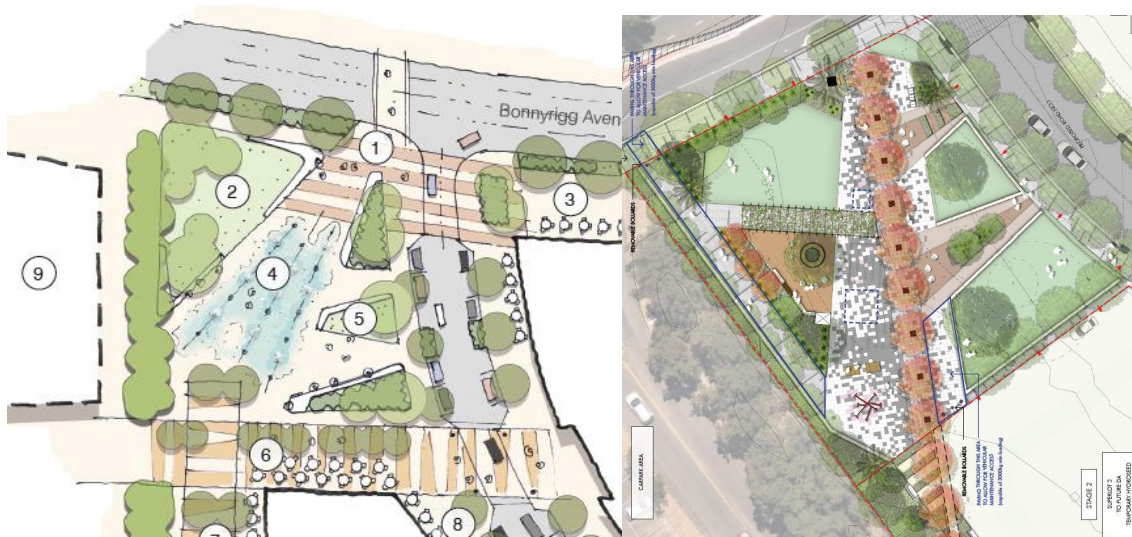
Concept Plan (Pictured on Left) and Proposed Landscape Plan (Pictured on Right) – Bonnyrigg Square
